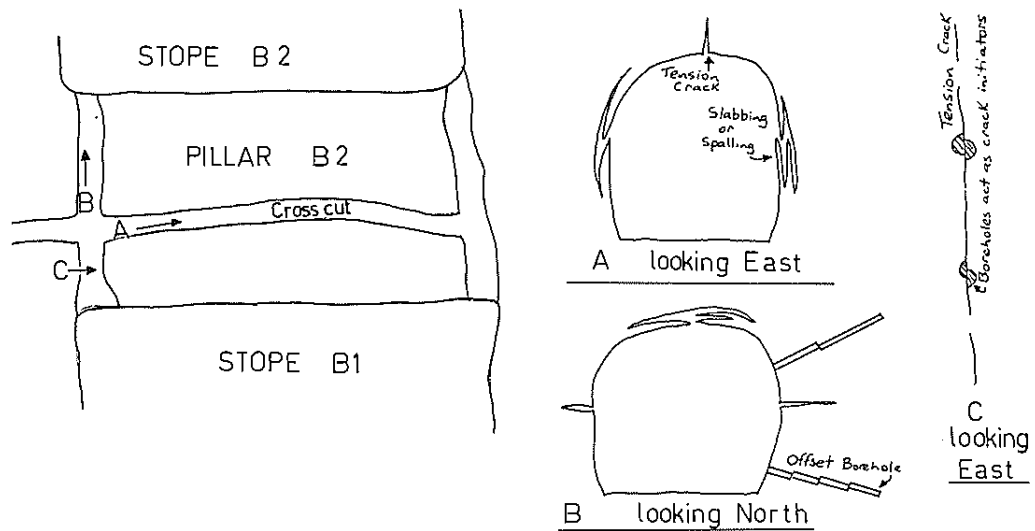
SKETCHES OF TYPICAL FAILURE PHENOMENA IN RIB PILLAR B.2
